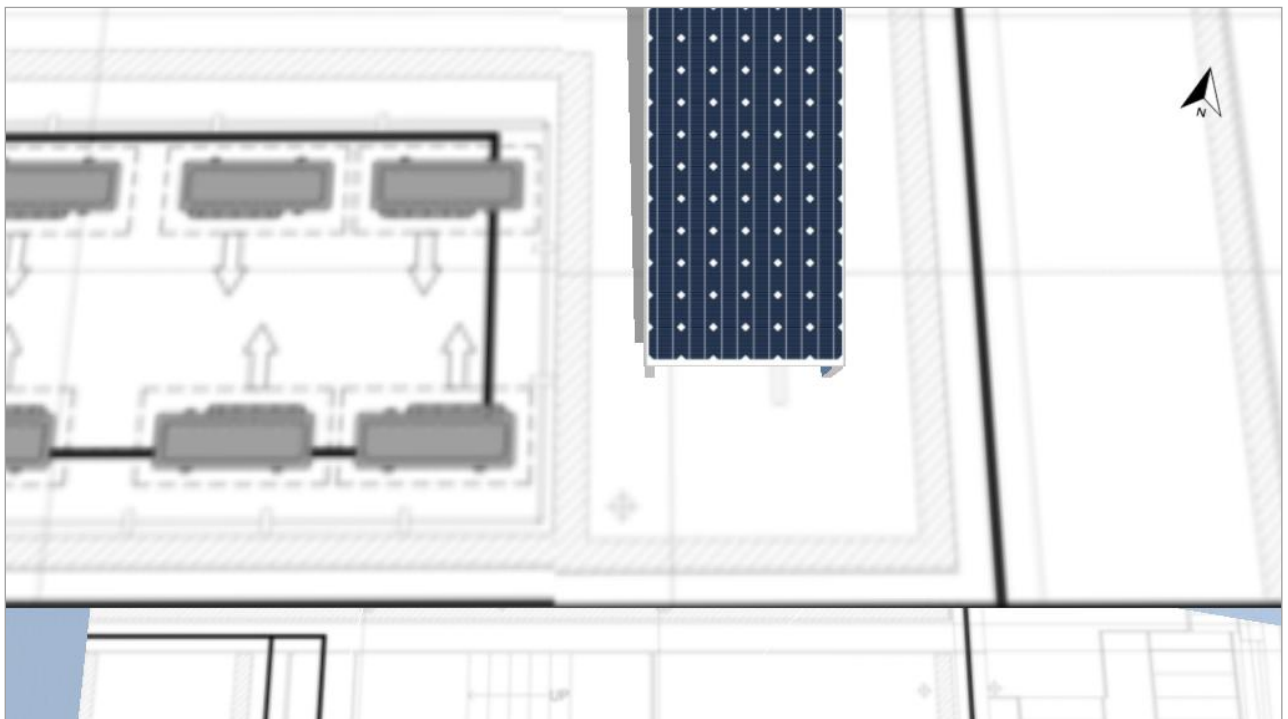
Module Area - Arbitrary Building 01-Mounting Surface North
